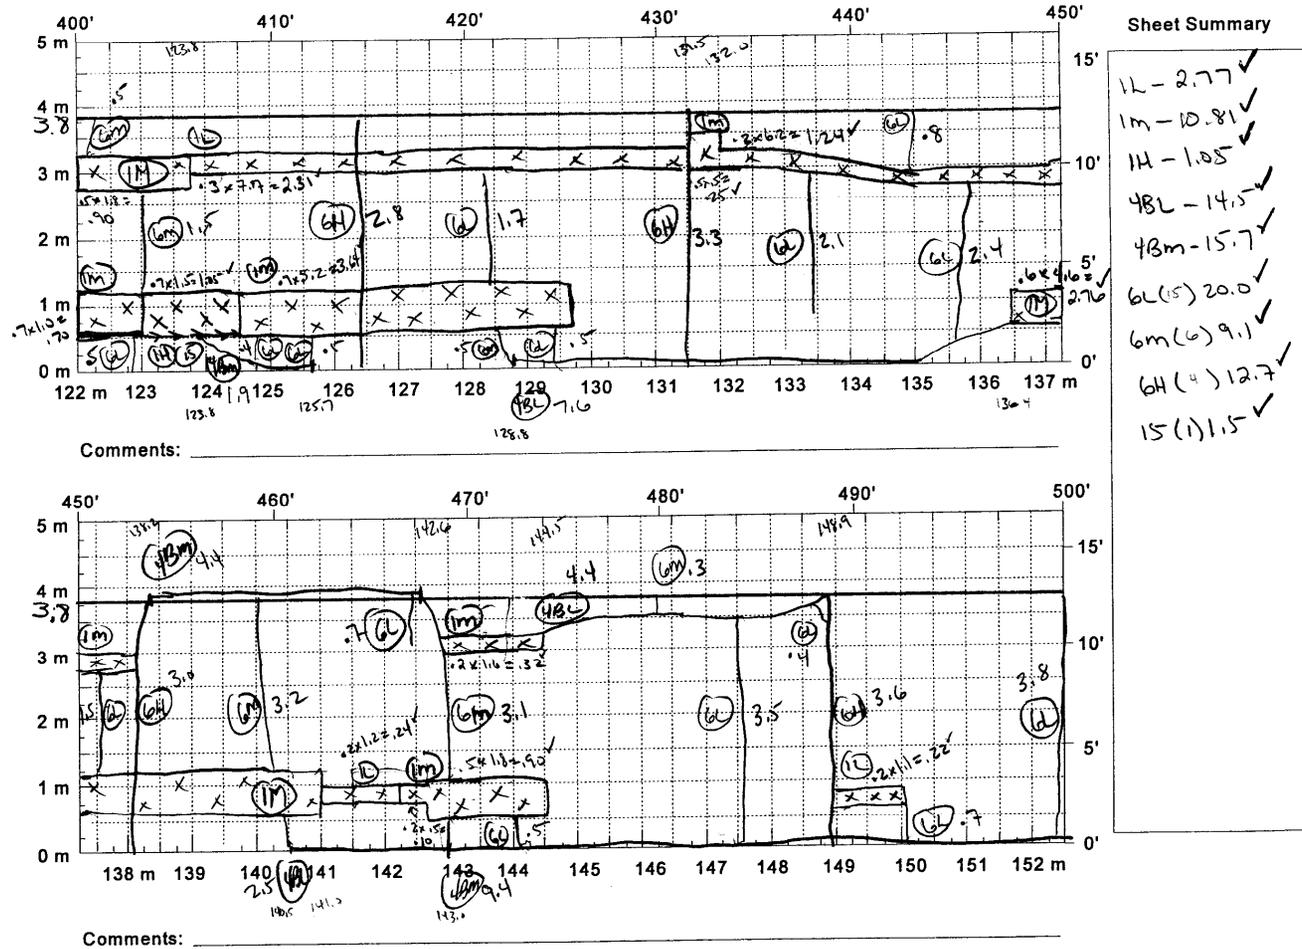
Pavement Distress Map; Station 4+00 to 5+00; Section 0509.
